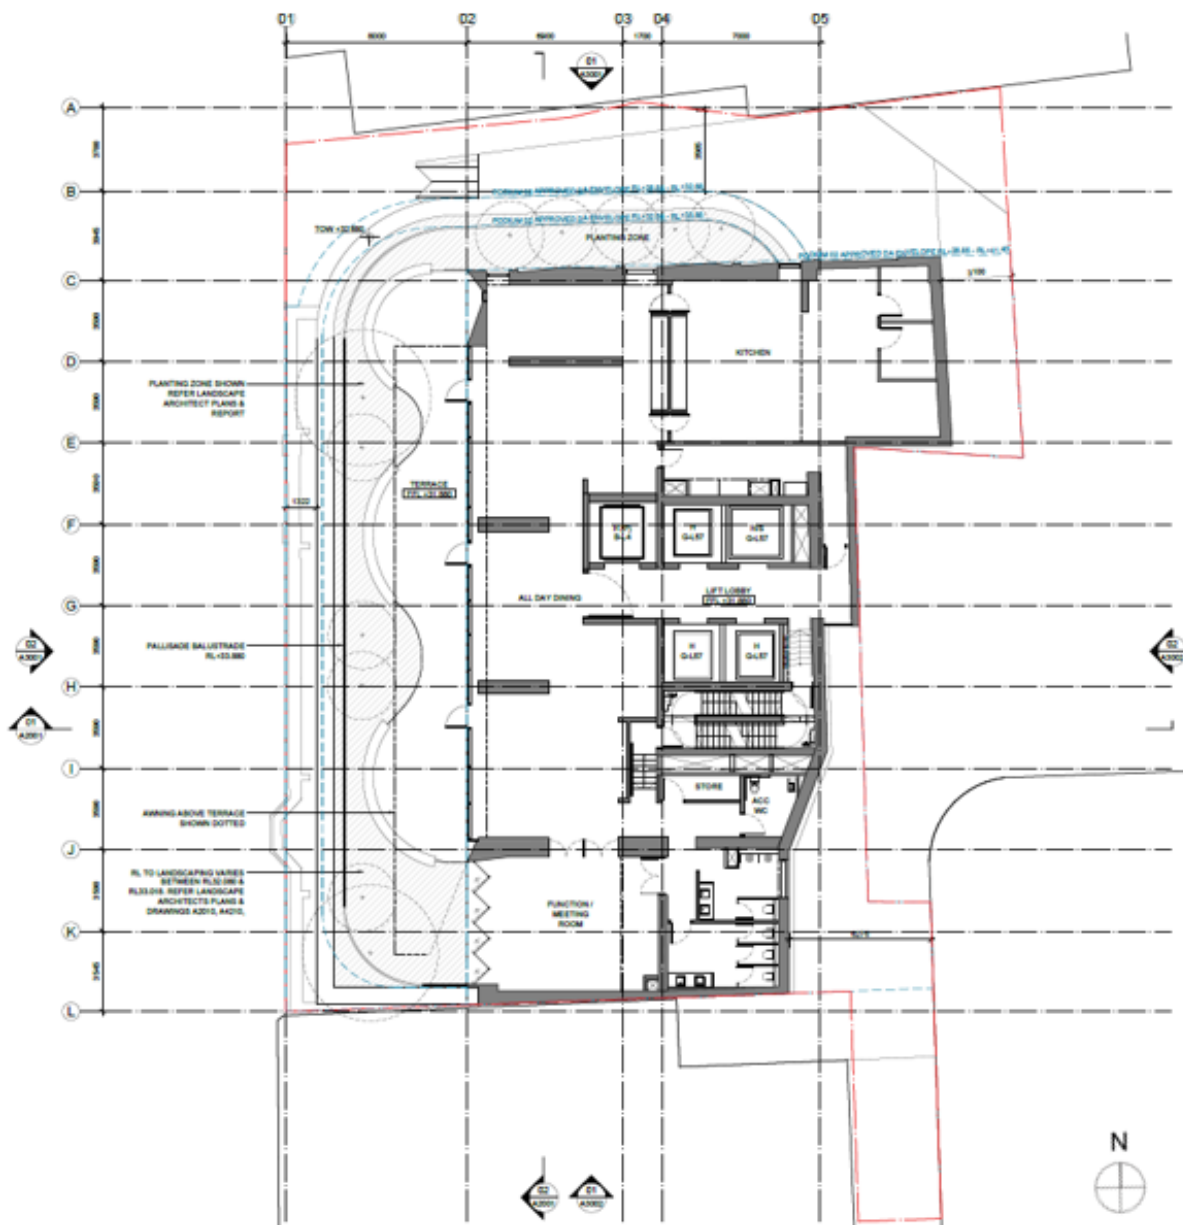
| Proposed second floor plan (Source: RtS architectural plans)
